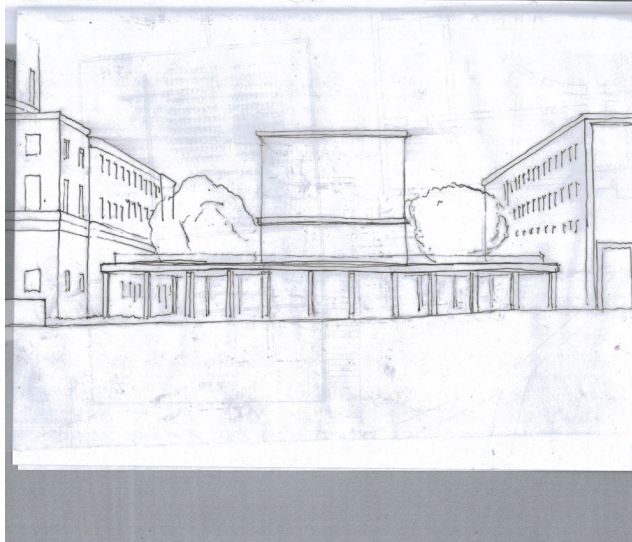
Sketch of the facade of the groundfloor connection. Made by author
